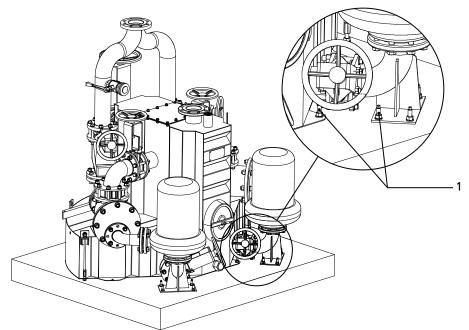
Fasteners front, centre: heavy-duty anchor bolts 90-3
